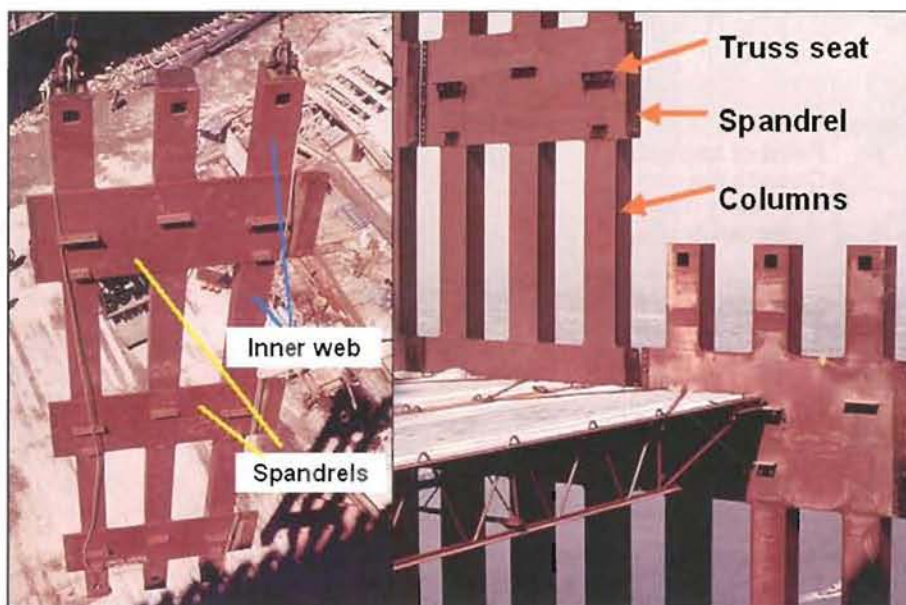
Modular, prefabricated perimeter panel and floor truss structures during construction of the World Trade Center Towers. Perimeter panels are 10 feet wide by 36 feet high. Perimeter panels, three columns wide and three stories tall, were hoisted into place and bolted to adjacent panels. Floor panels, typically 20 feet wide and 35 feet or 60 feet long, were then positioned onto the truss seats. (Photo source unknown. Enhanced by NIST.)
